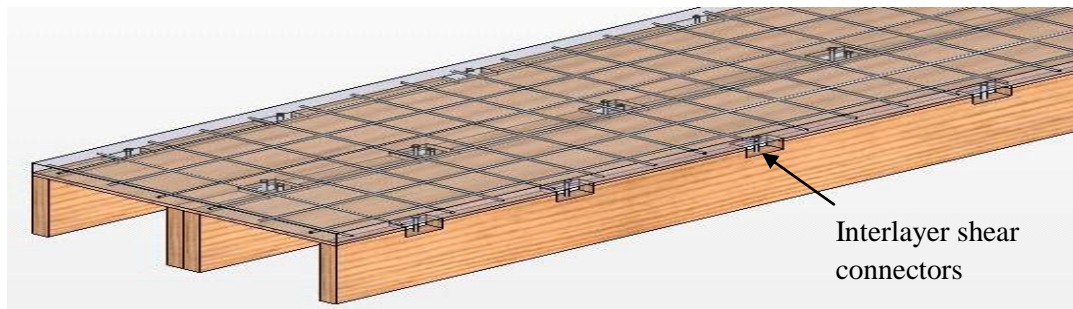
The “M”-section semi-prefabricated LVL concrete composite floor system, source from Smith (2008).
